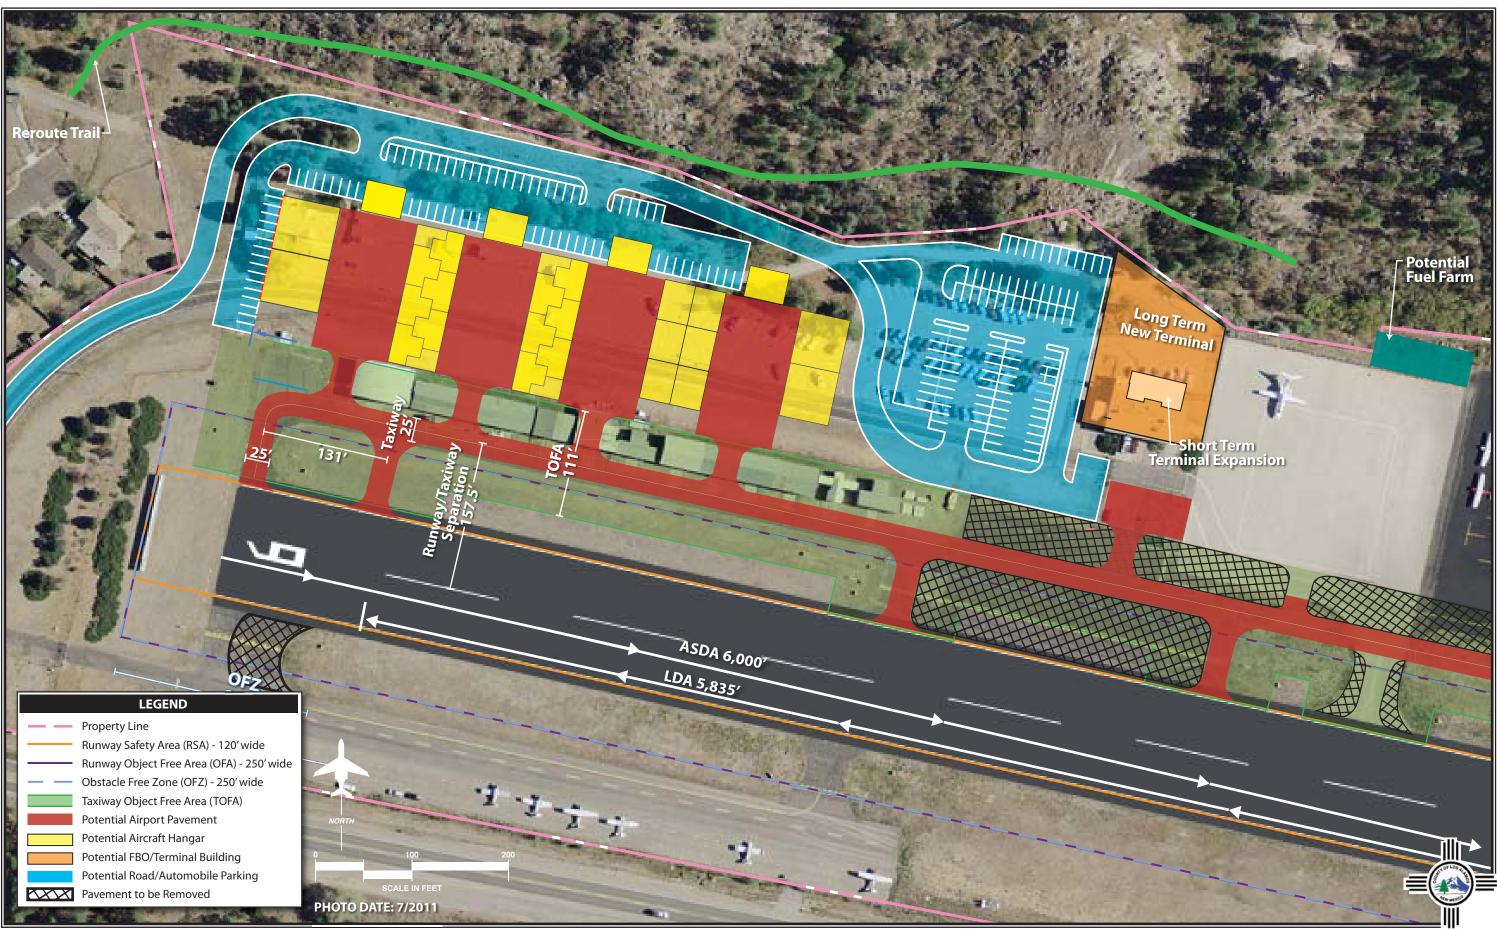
C RECOMMENDED TERMINAL AREA PLAN
